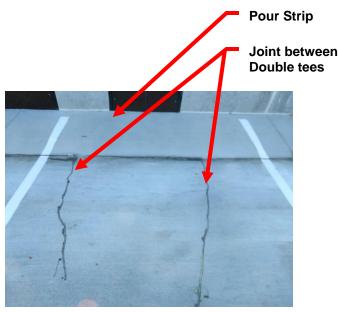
Cracks at end of double tee in line with at stem connections to wall (cracks in pour strips are not visible)
